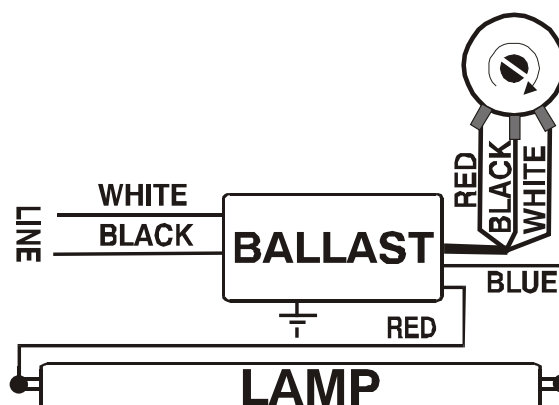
Typical connections from ballast for use with Preheat Lamps
